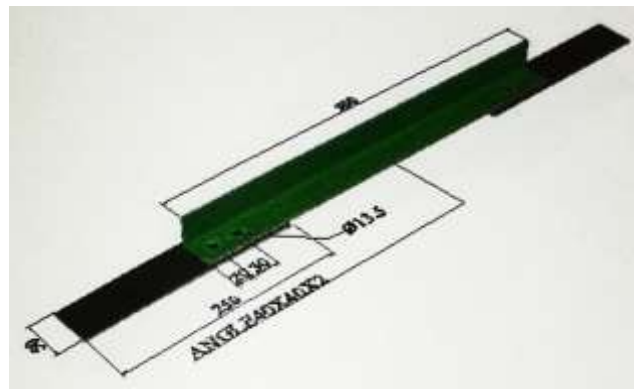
Details of single plain angle specimen provided with bolts in single row
